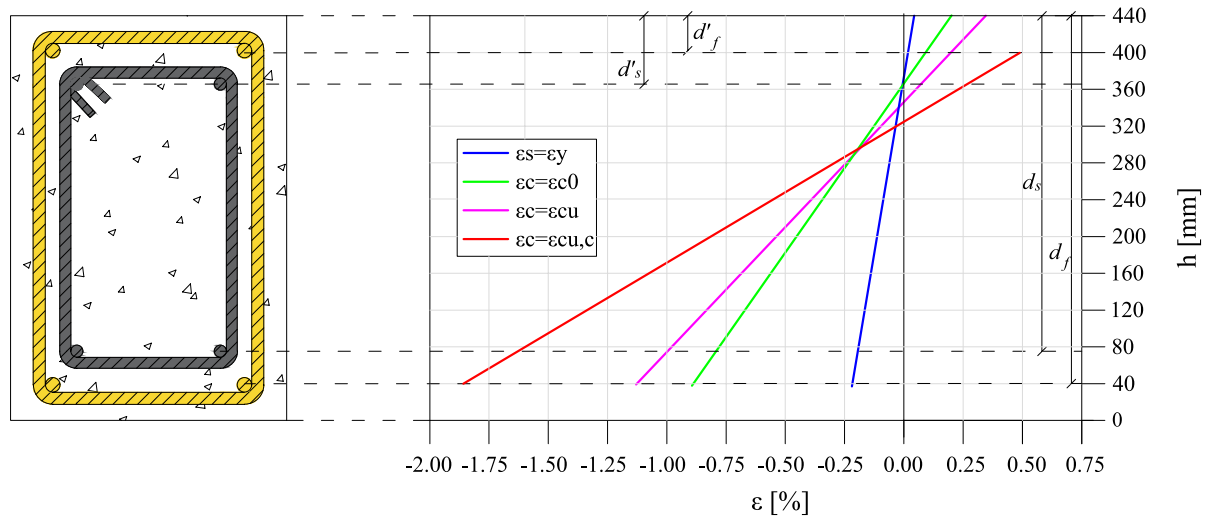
Strain diagram of a hybrid-RC section with confined concrete
